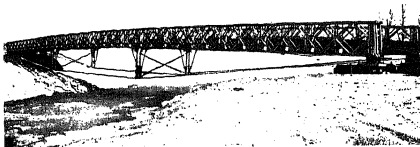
Cable reinforcement set installed on a 180-foot triple-single Bailey bridge (class 50/60).
